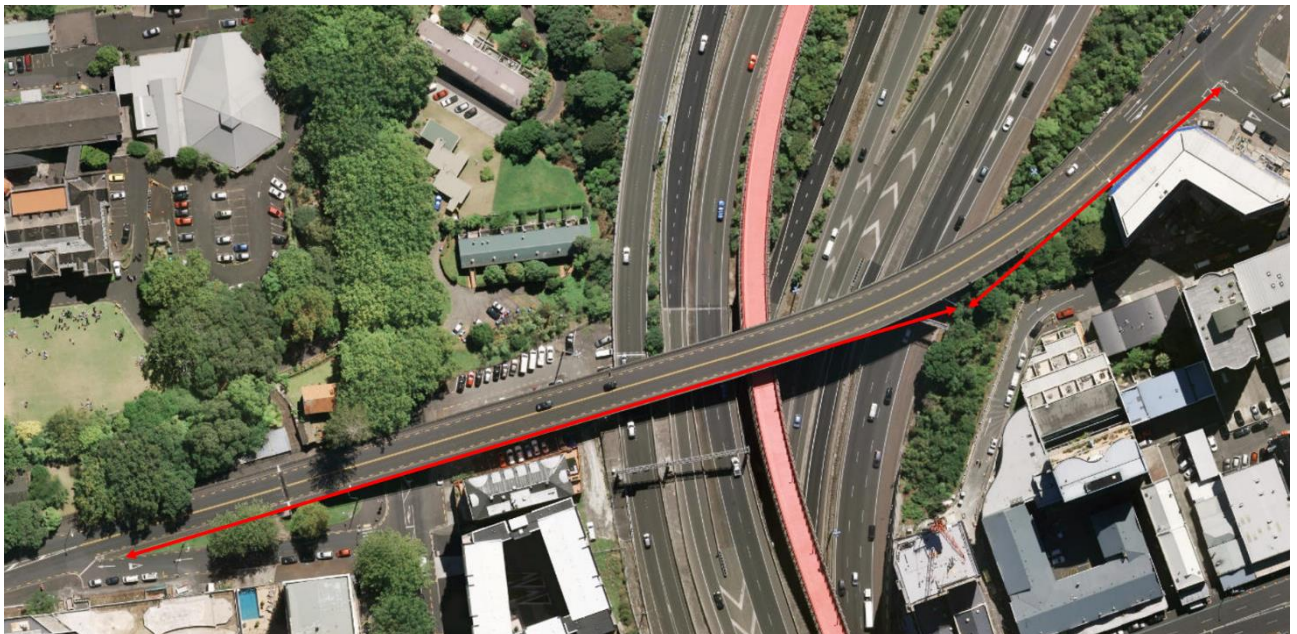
Aerial view of Hopetoun Street - Geomaps
